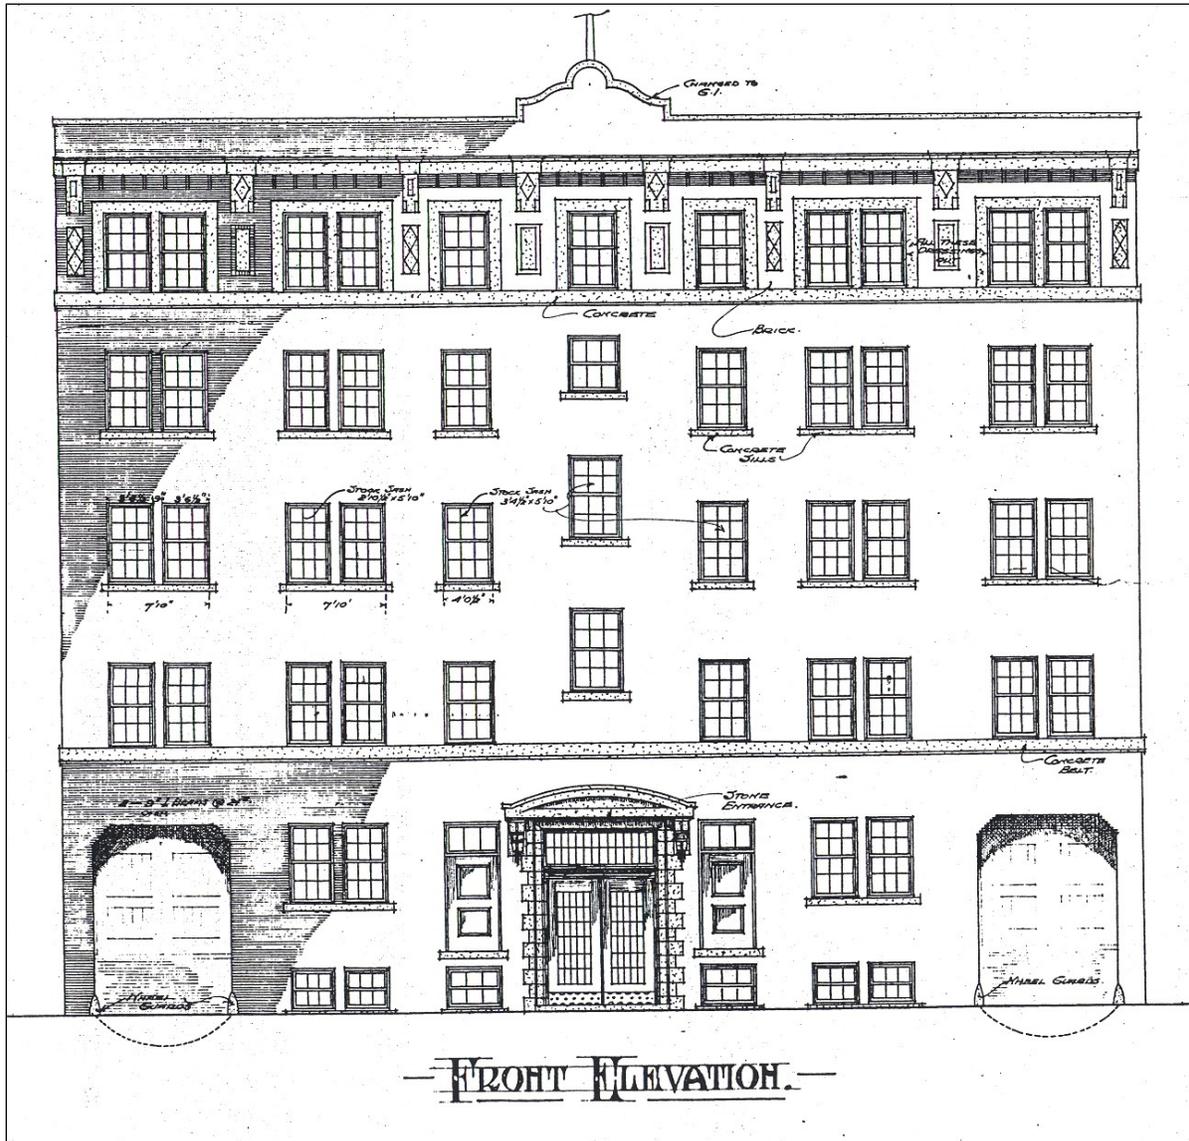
Architect’s plans, #3482/1912, “Front Elevation”. Note that there were plans for a second dray way at the west end of the building and the fenestration framing the entrance was slightly different than built. (Courtesy of the City of Winnipeg Archives.)
